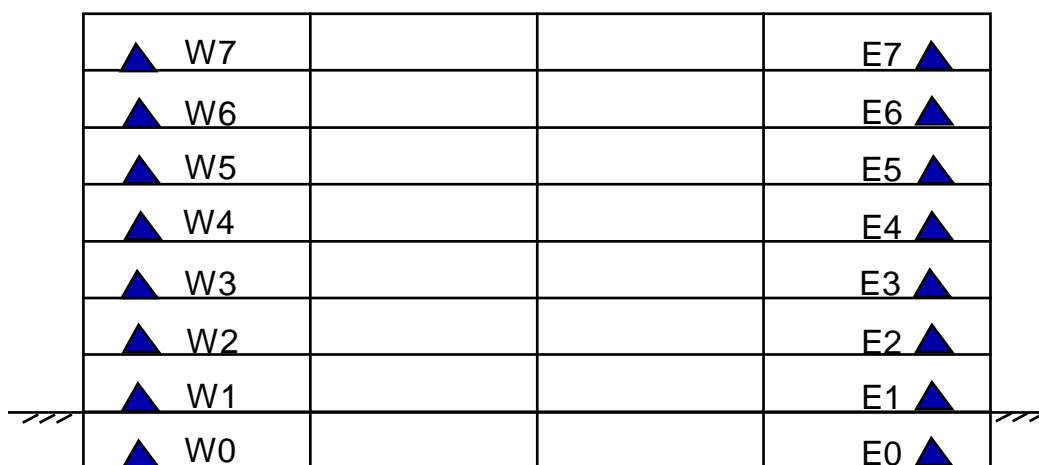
Structural section (EW) of the reinforced concrete building and the 16 Station locations: the H/V spectral ratio measurements were made at 16 different locations inside the building (basement, and the first to the seventh floor at both ends of the building)
